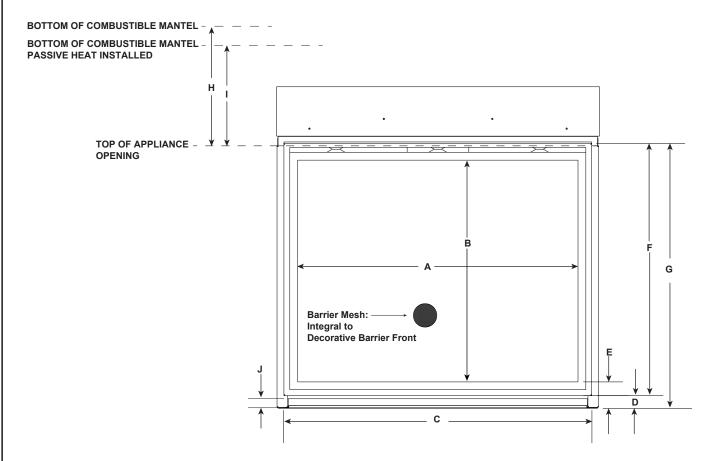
Decorative Barrier Front Dimensions - MANOR
